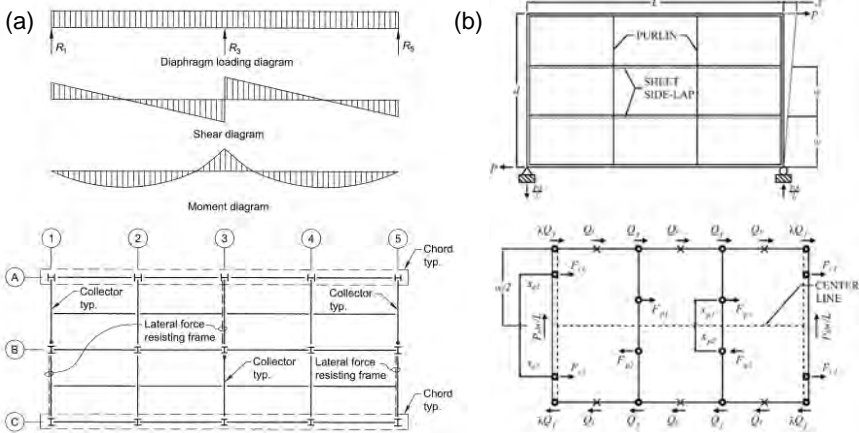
Steel Diaphragms: (a) Diaphragm Internal Forces and Elements (AISC, 2010); (b) Diaphragm Bay and Deck Panel Forces (SDI, 2004).
